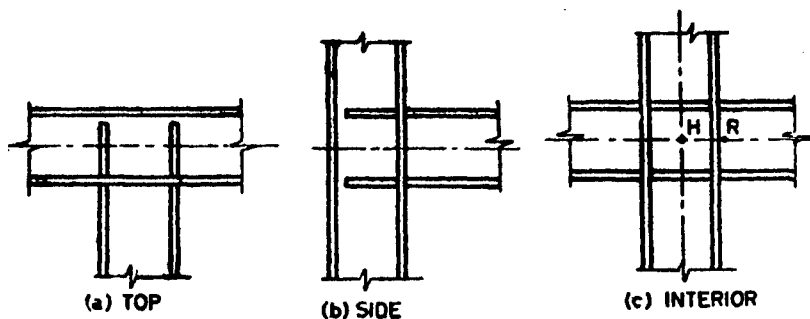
BEAM TO COLUMN CONNECTIONS OF (a) TOP, (b) SIDE, AND (c) INTERIOR TYPE
